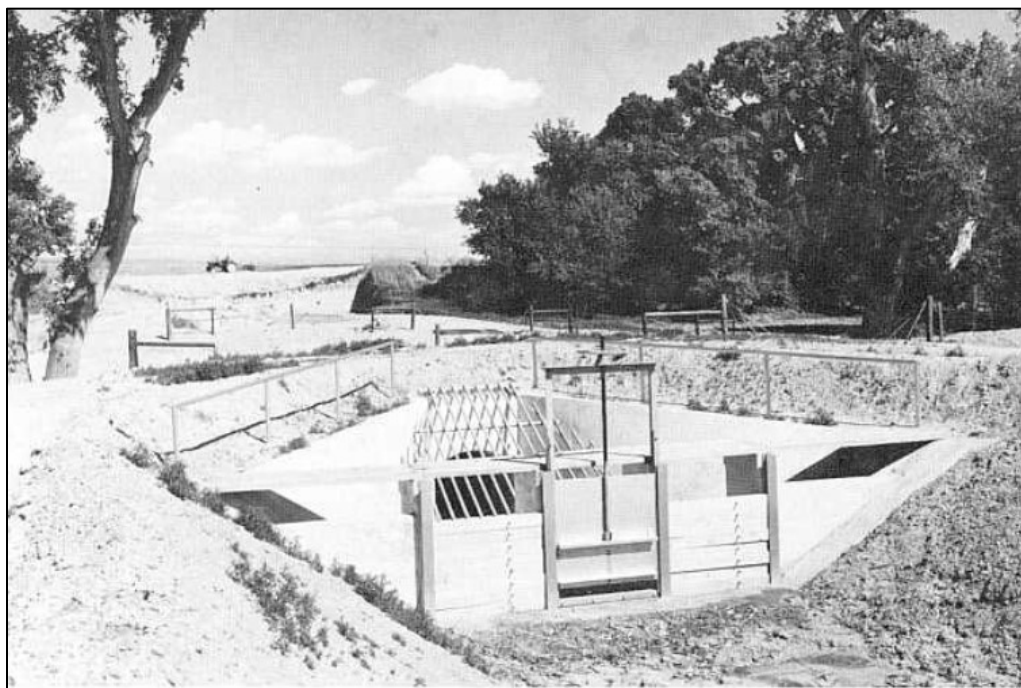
Trash gate over pipe mouth in a check inlet to a pipe (culvert) structure on an unknown Reclamation project.³¹¹
